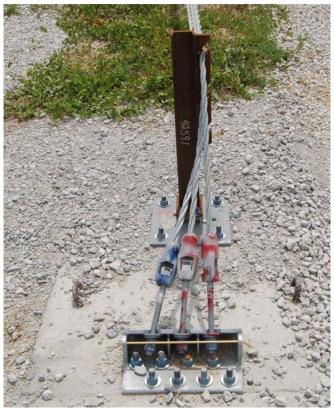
End Anchorage Photographs, Test No. NYCC-3
